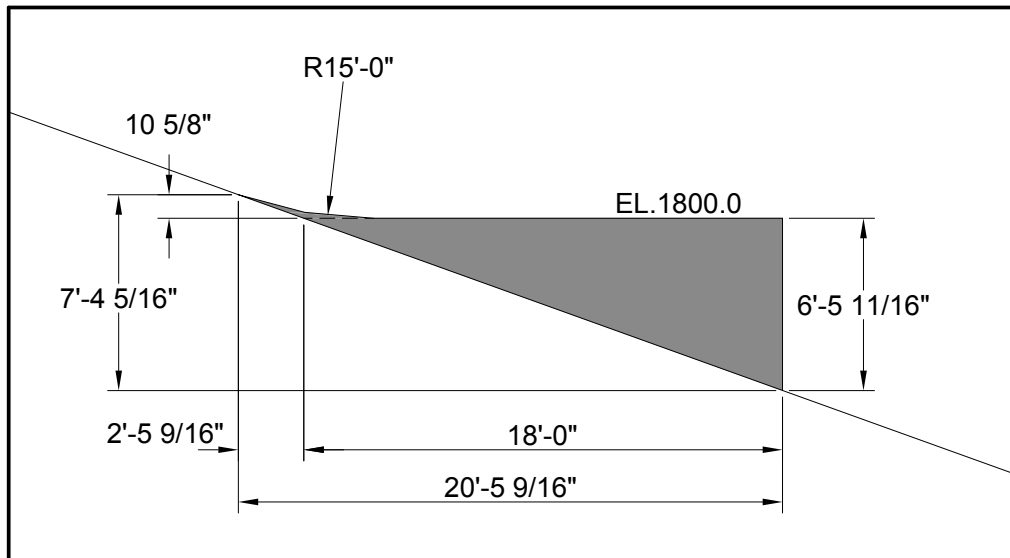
Geometry of the 18-foot horizontal deflector (prototype dimensions)
